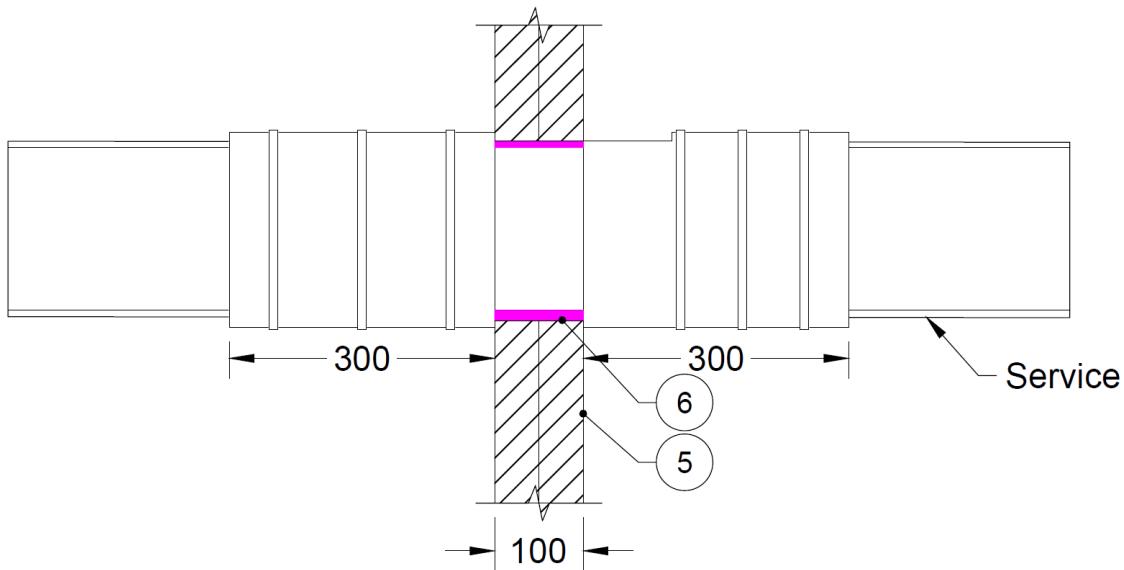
Section View of Pair coil, drain hose and cables Installed in Vertical Substrates
